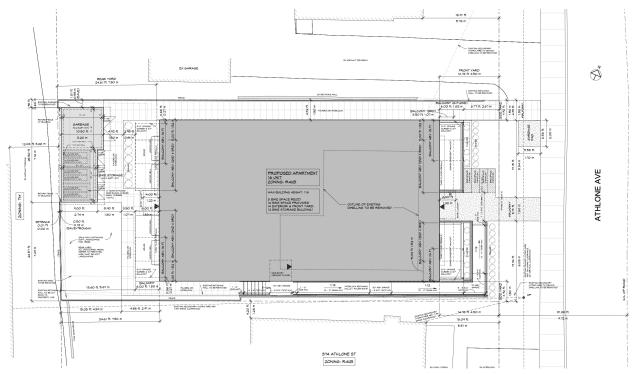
Proposed Site Plan (Source: Grant Henley Design Group)
